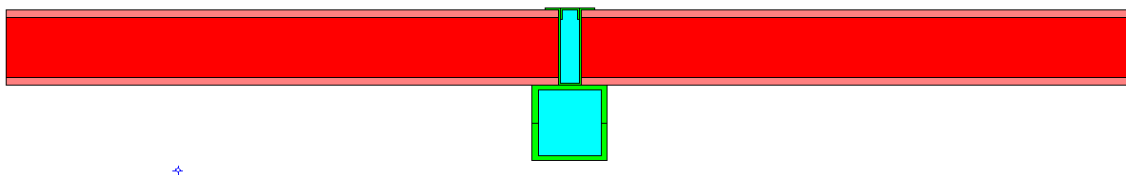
SECTION OF THE THERMAL BRIDGE IN THE OUTER WALL
